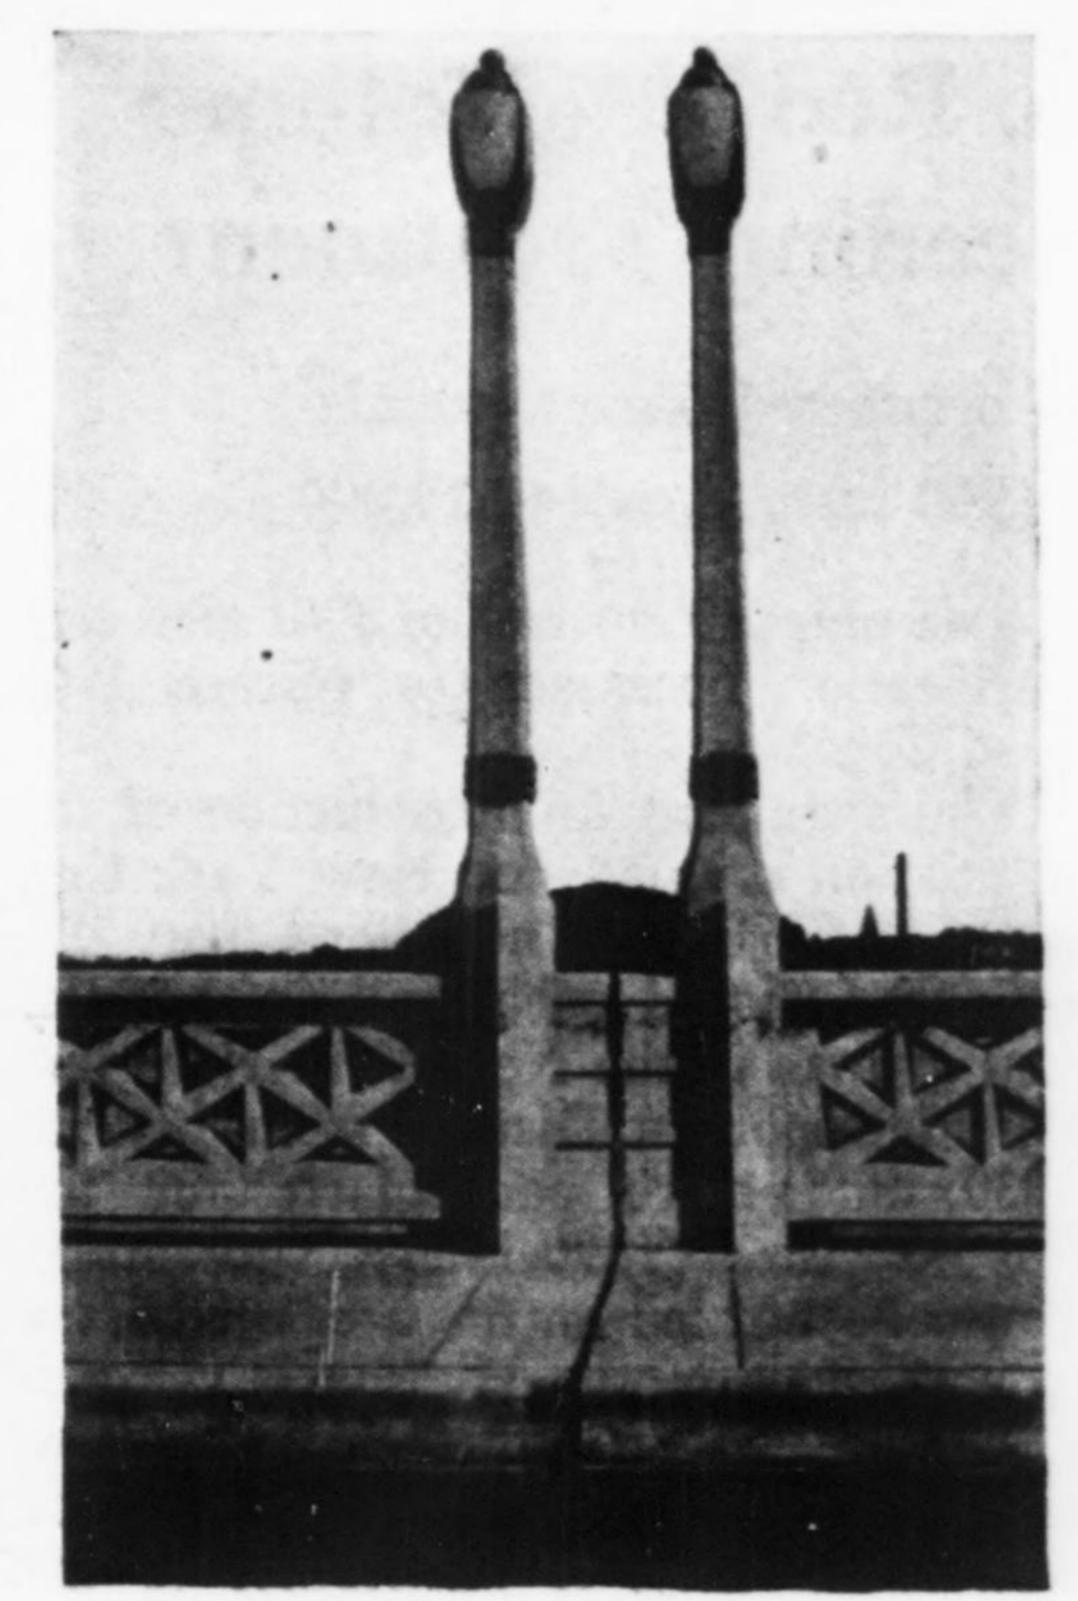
Lamp standards and parapet. Expansion joint is open in parapet, filled in the sidewalk and covered by bituminous paving in the roadway.
